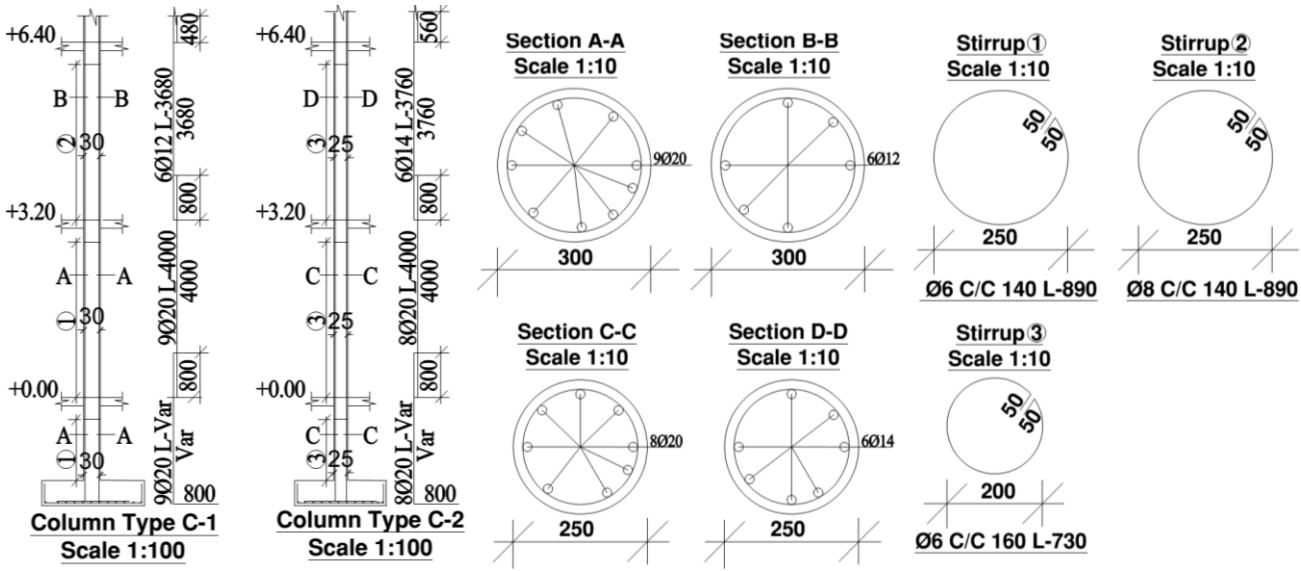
Sample column detailing for G+2 building with C-40 concrete
